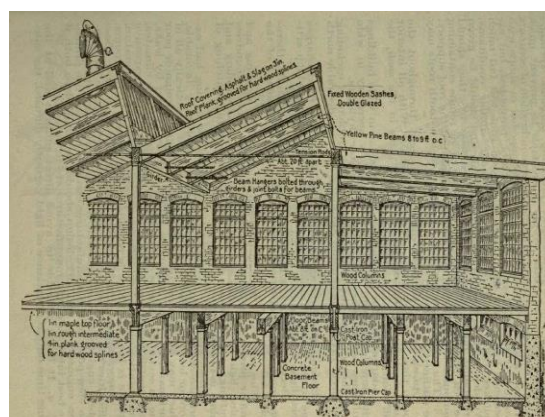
Depiction of a building similar to the 1898 mill (image from [68]).
